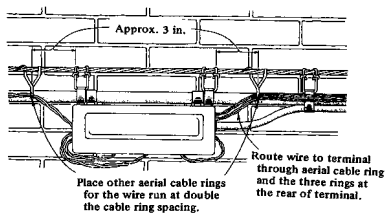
Running Wires to Terminal Installed on Strand Supporting Block Cable Attached to a Building
